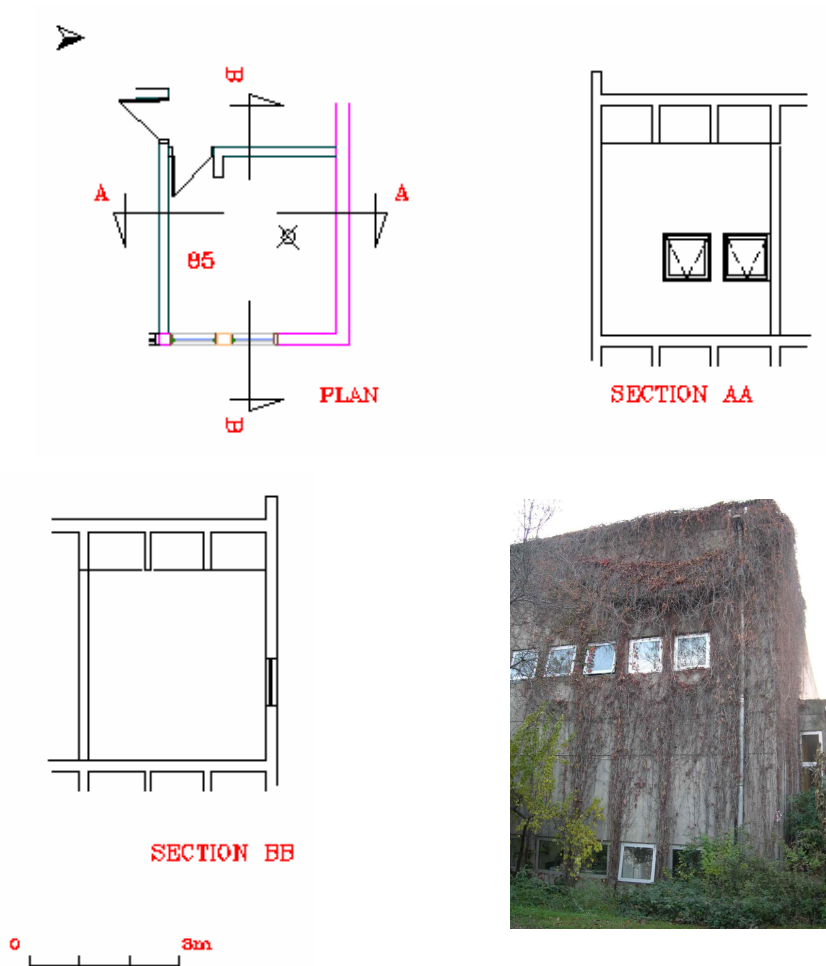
Floor plan, section AA, section BB and exterior view of Room 85.
